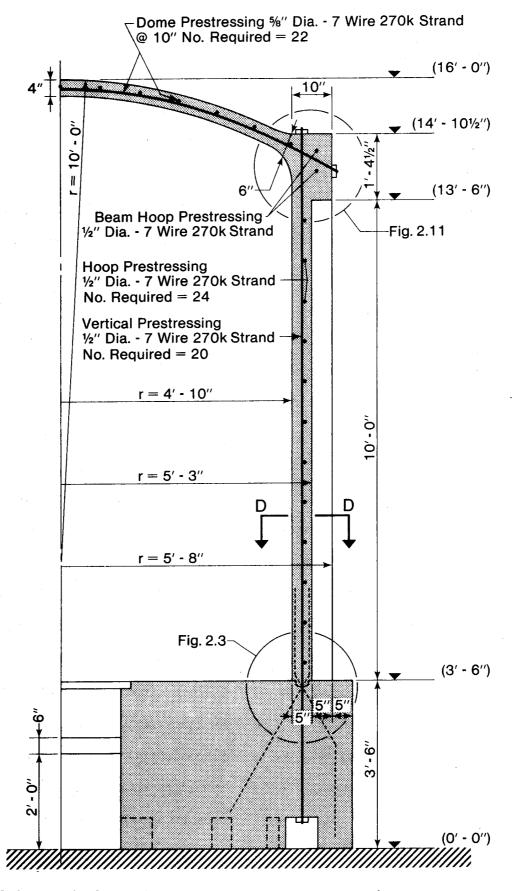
Vertical Section Through Test Structure - (Section BB - Fig. 2.3)
